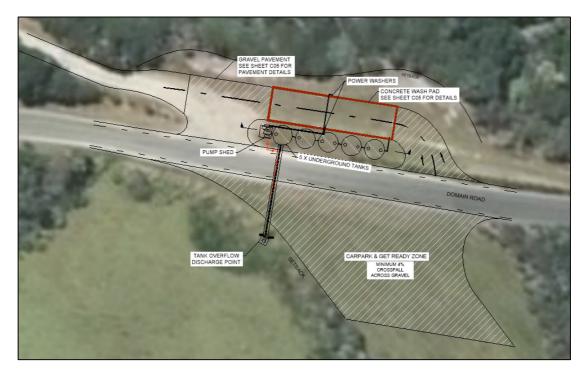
Proposed washdown facility - general arrangement. See sheet C02 of the drawing set in Appendix B.
